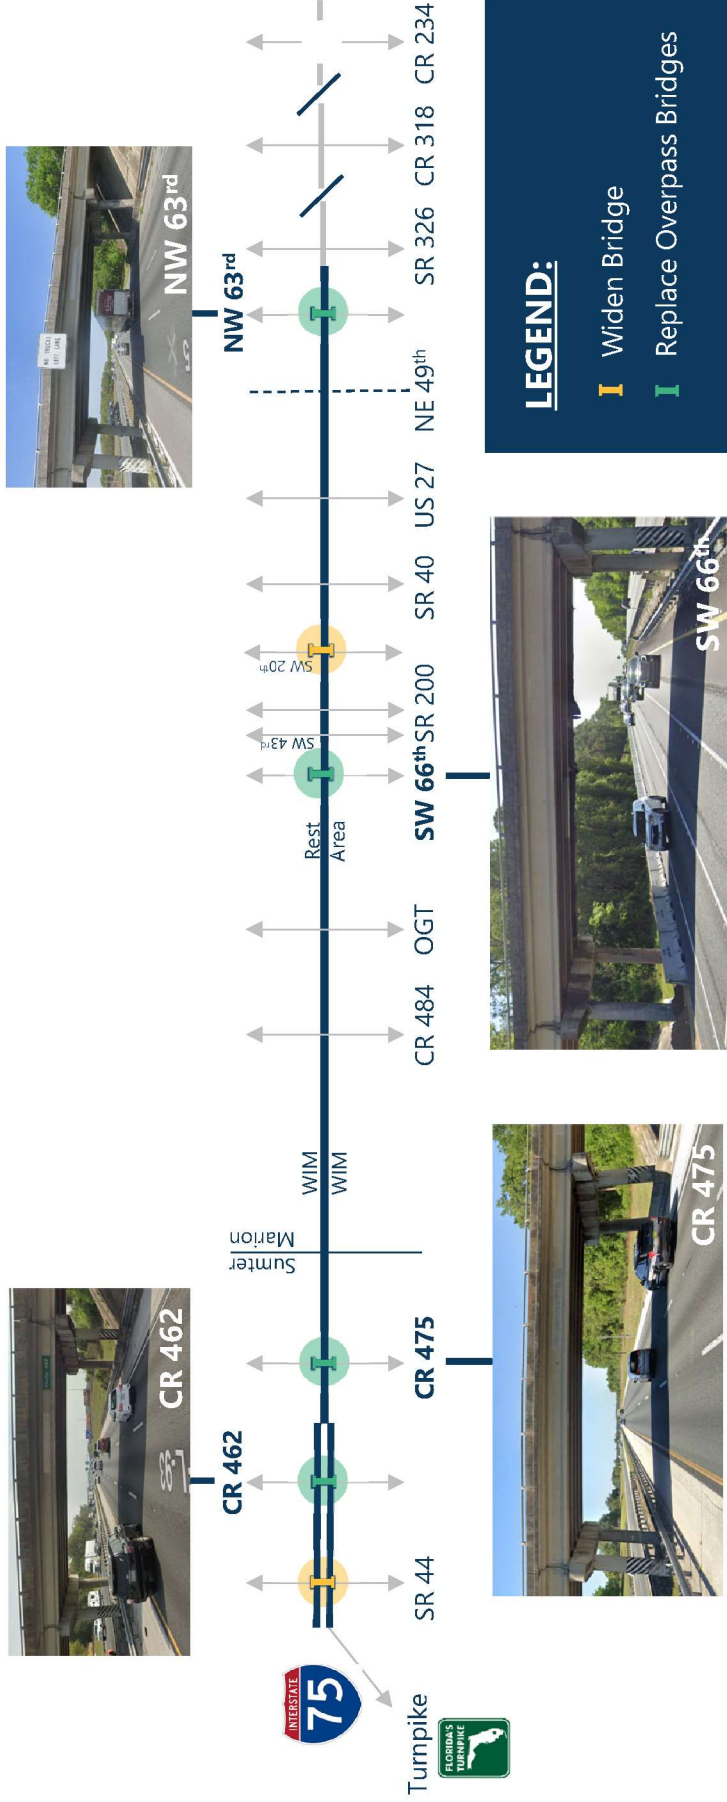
I-75 Mainline Bridge Widening and Replacement Locations
